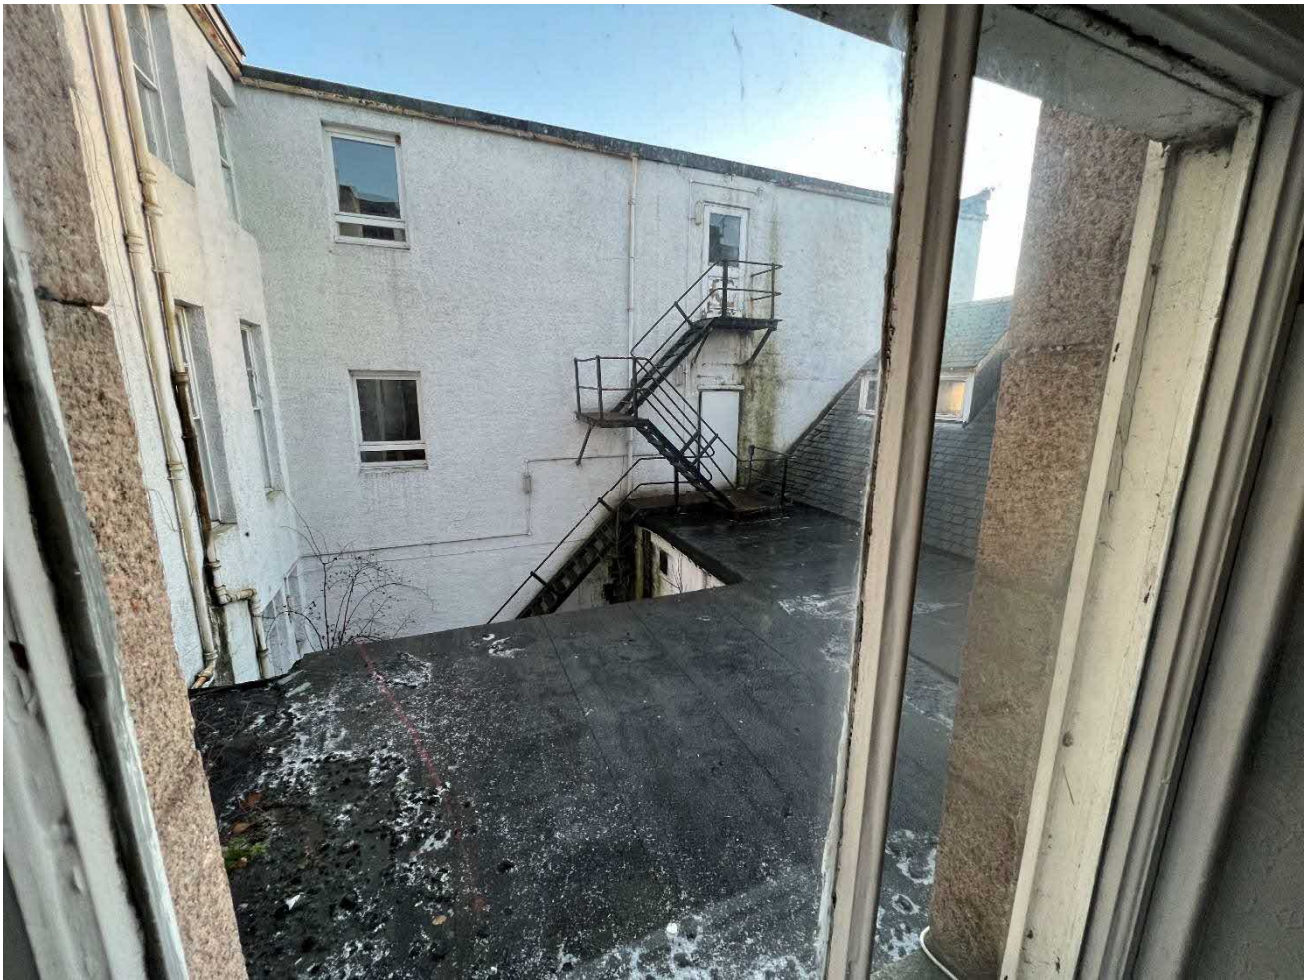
Photograph of internal courtyard elevation of rear bedroom block showing the existing white pvc windows that are to be either retained or replaced.
